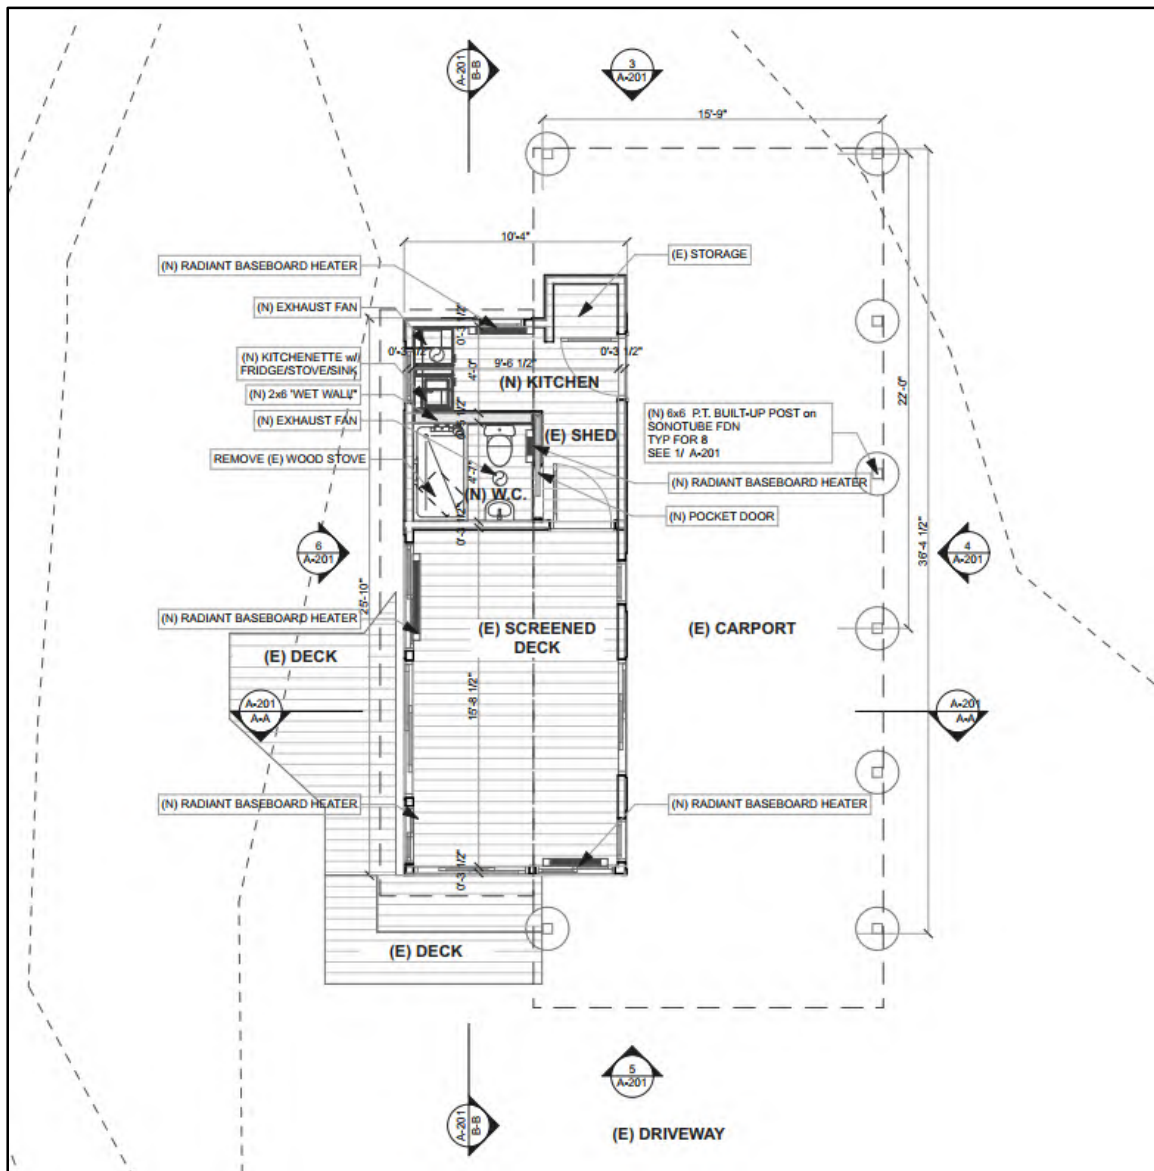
Submitted floor plans for proposed dwelling addition onto existing carport
